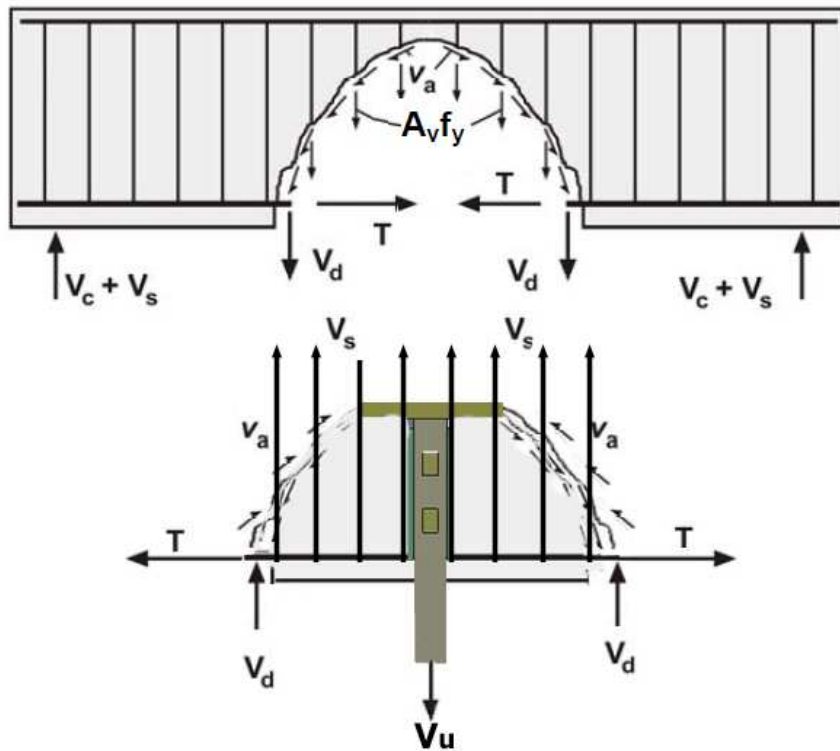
Load transfer mechanism for the connection with transverse reinforcement (Stirrups)
